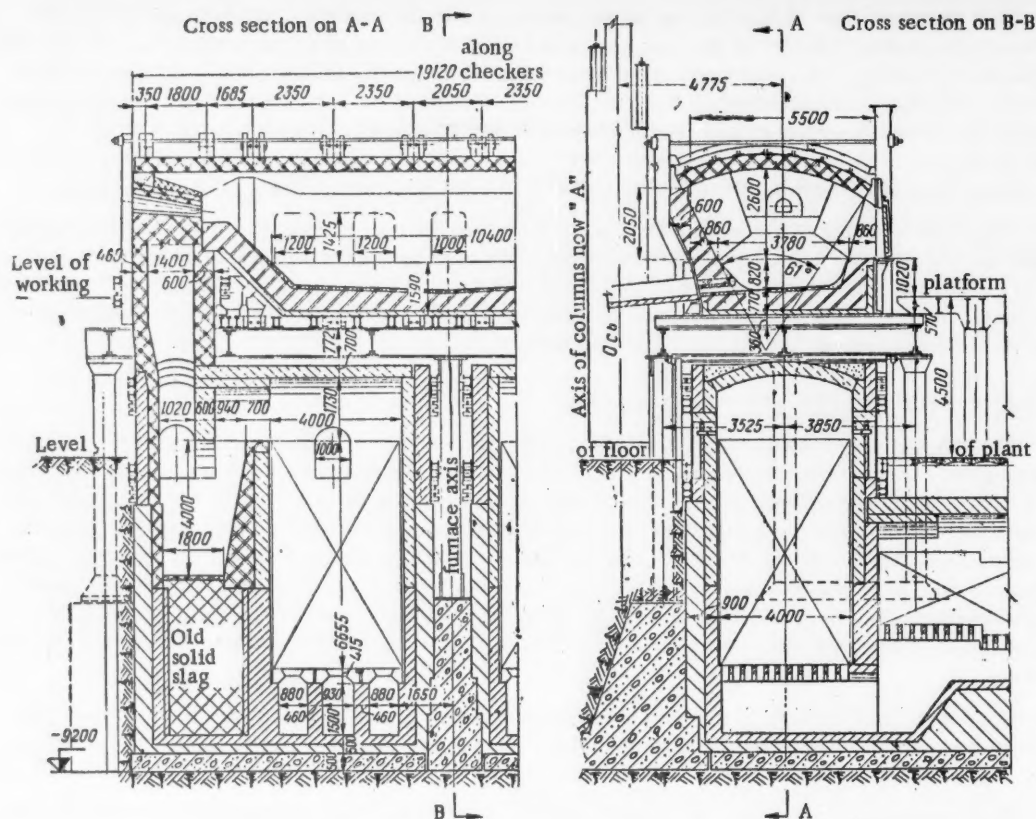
Longitudinal section cross section of 110-ton open-hearth furnace before reconstruction.
